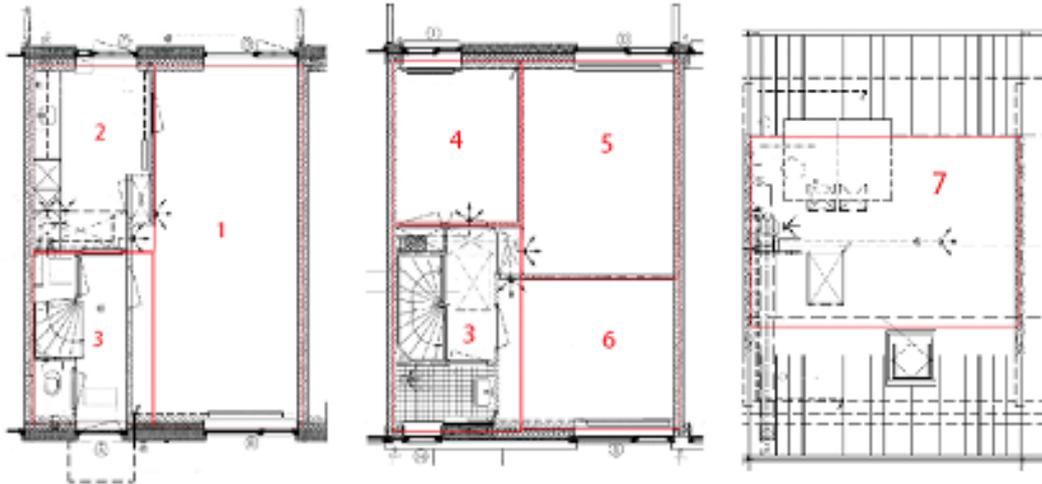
Plant of modelled passive house a) Ground floor: zone 1 – living room; zone 2 – kitchen; zone 3 – bathroom + hall; b) First floor: zone 3 – bathroom + hall; zones 4, 5 and 6 – bedrooms; c) Second floor: zone 7 – attic
